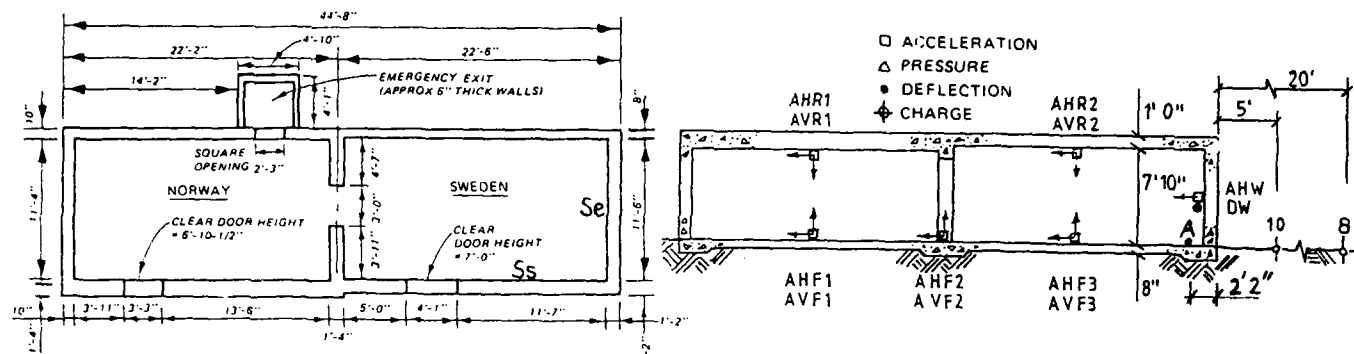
Plan view, elevation view, and gage layout. Point A indicate position of the deflection gage mounting
